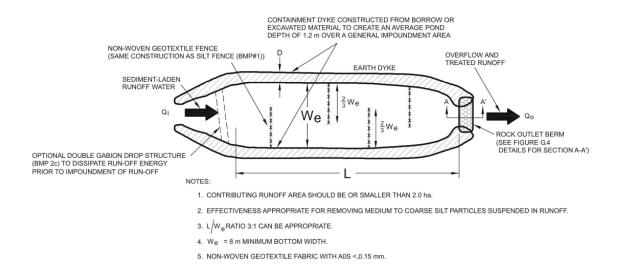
e: Type II Containment Structure (Sediment Trap Plan)
